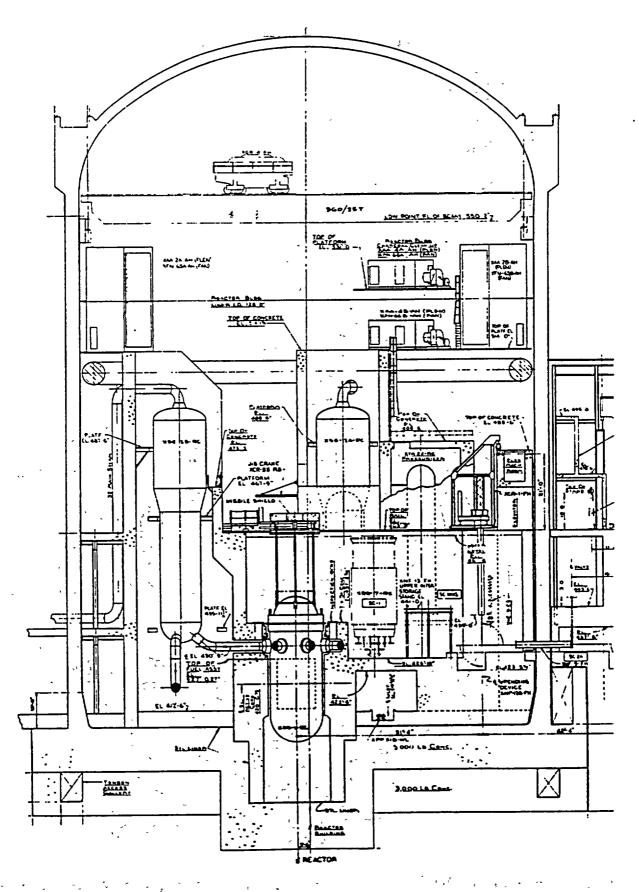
Section Views of the Summer Large, Dry Containment (3-D Post-Tensioned Concrete) (Sheet 2 of 2)
